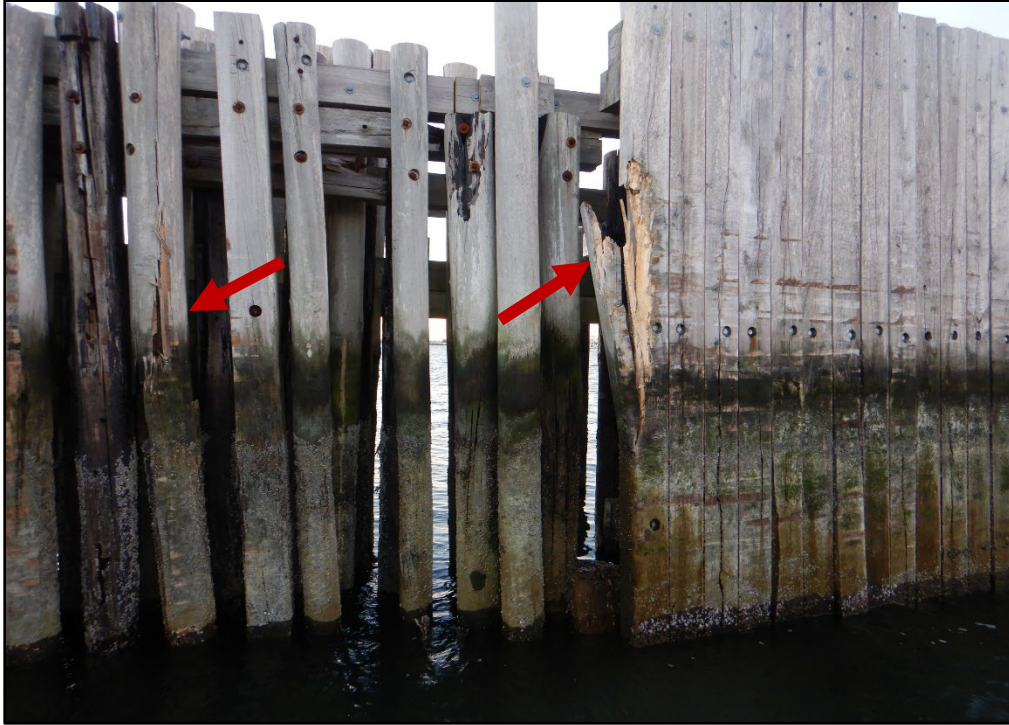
Broken timber piles making up the south timber fender rack at Hart Island, looking south.
